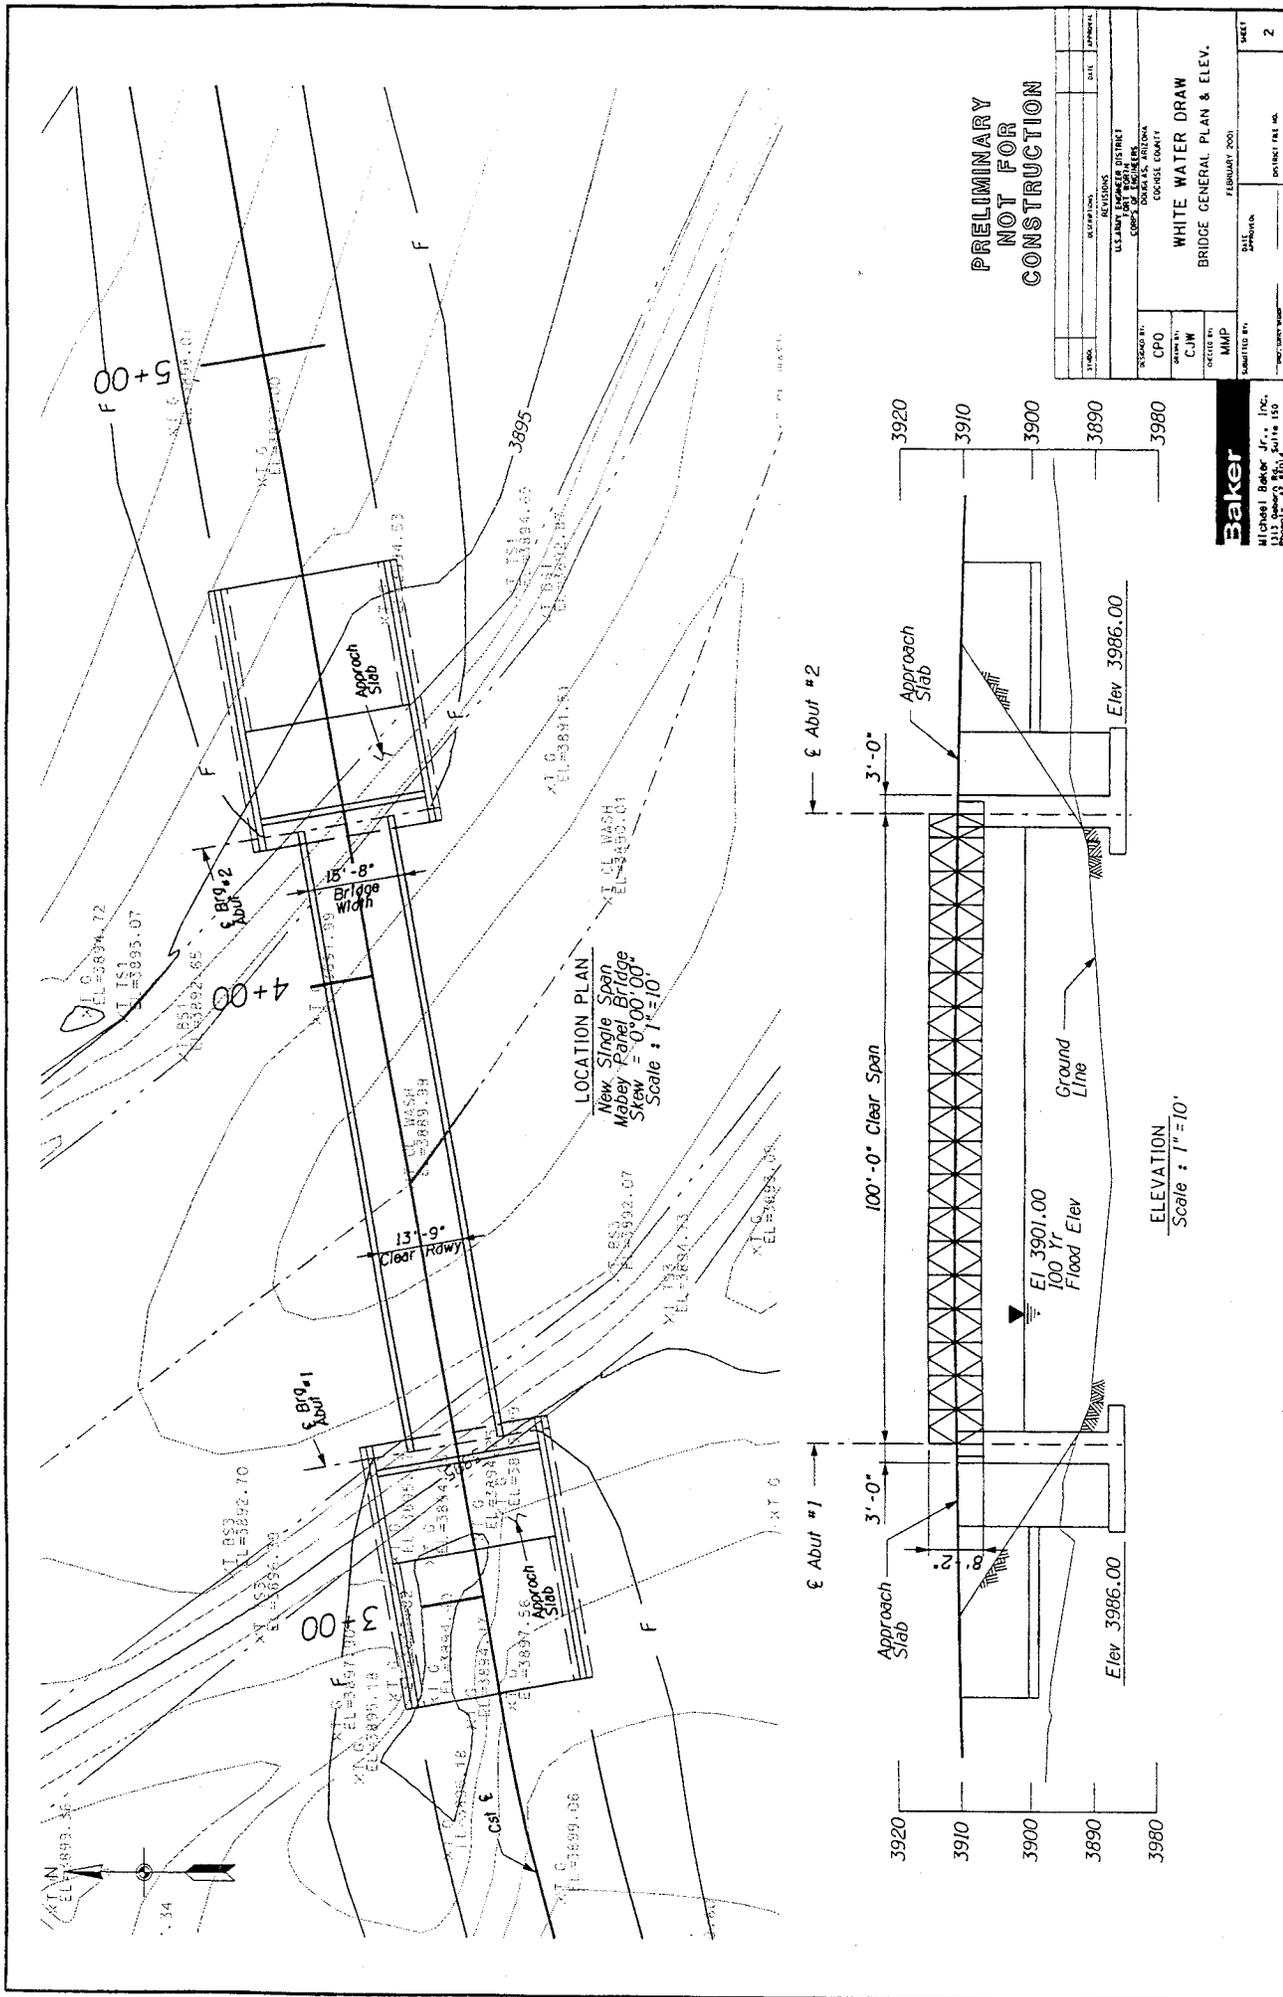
Preliminary Engineering Design for Bridge Structure at Whitewater Draw
